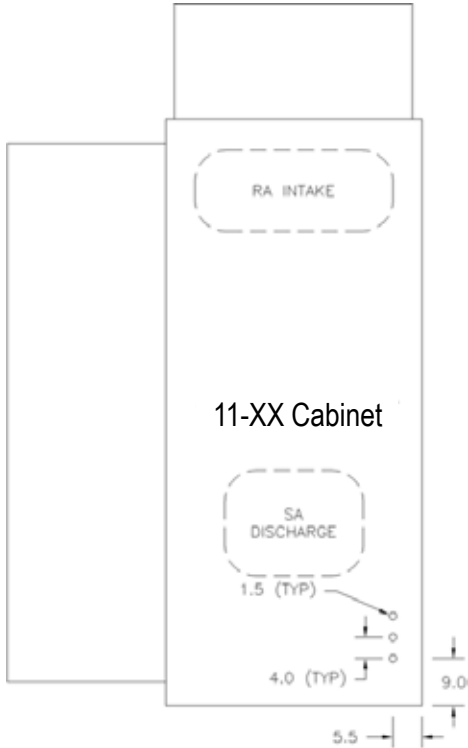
AR-DR / AR-DE 21-XX Chassis Access Holes.
